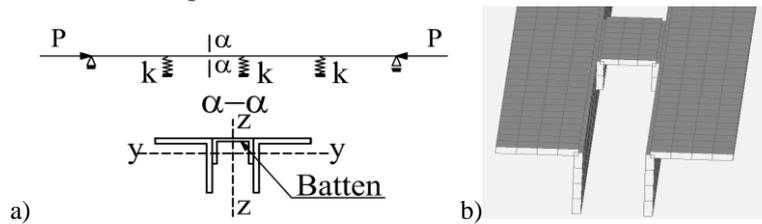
Bar with the built-up cross section: a) static schema, b) shell model
